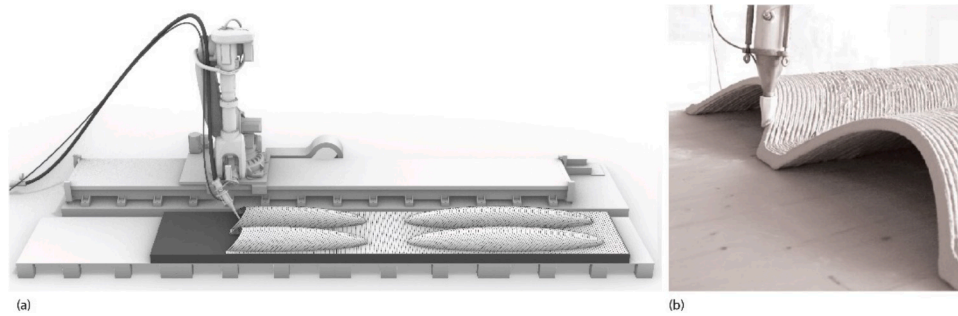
The Nubian Slab - 3D Concrete Printed stay-in-place formwork for vaulted slabs: (a) upscaling fabrication [18]; (b) material deposition by horizontal stacking (Photo: Andrei Jipa, Digital Building Technologies ETH Zurich).
